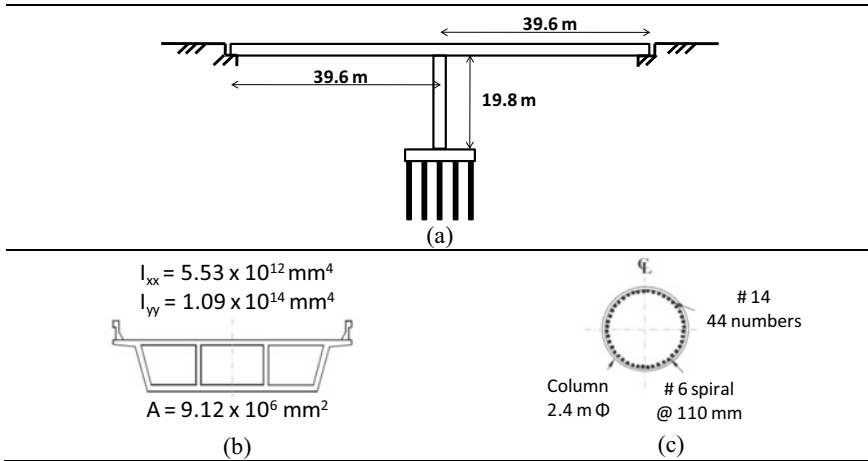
a Side view, b deck and c pier cross section details of study bridge [1, 2]
